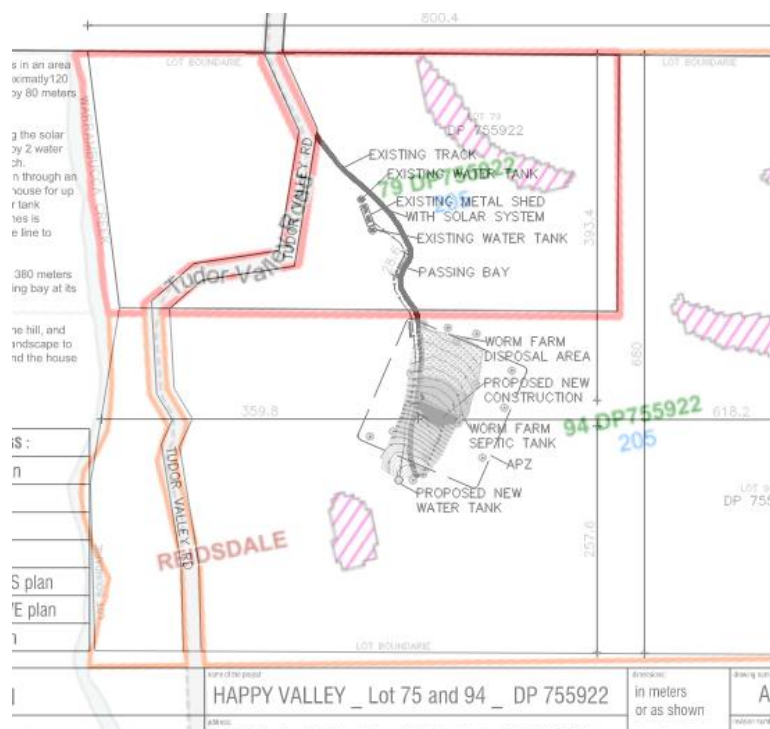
Slopes over 18 degrees overlay on applicants site plan
